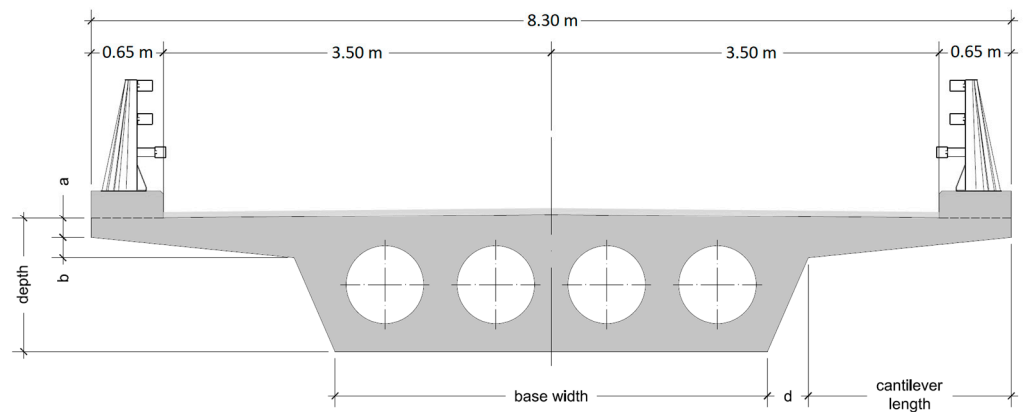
Cross-sectional view of the lightweight PC slab bridge deck [21,22].
